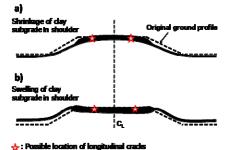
Mechanism of longitudinal crack development on pavements over expansive clays
